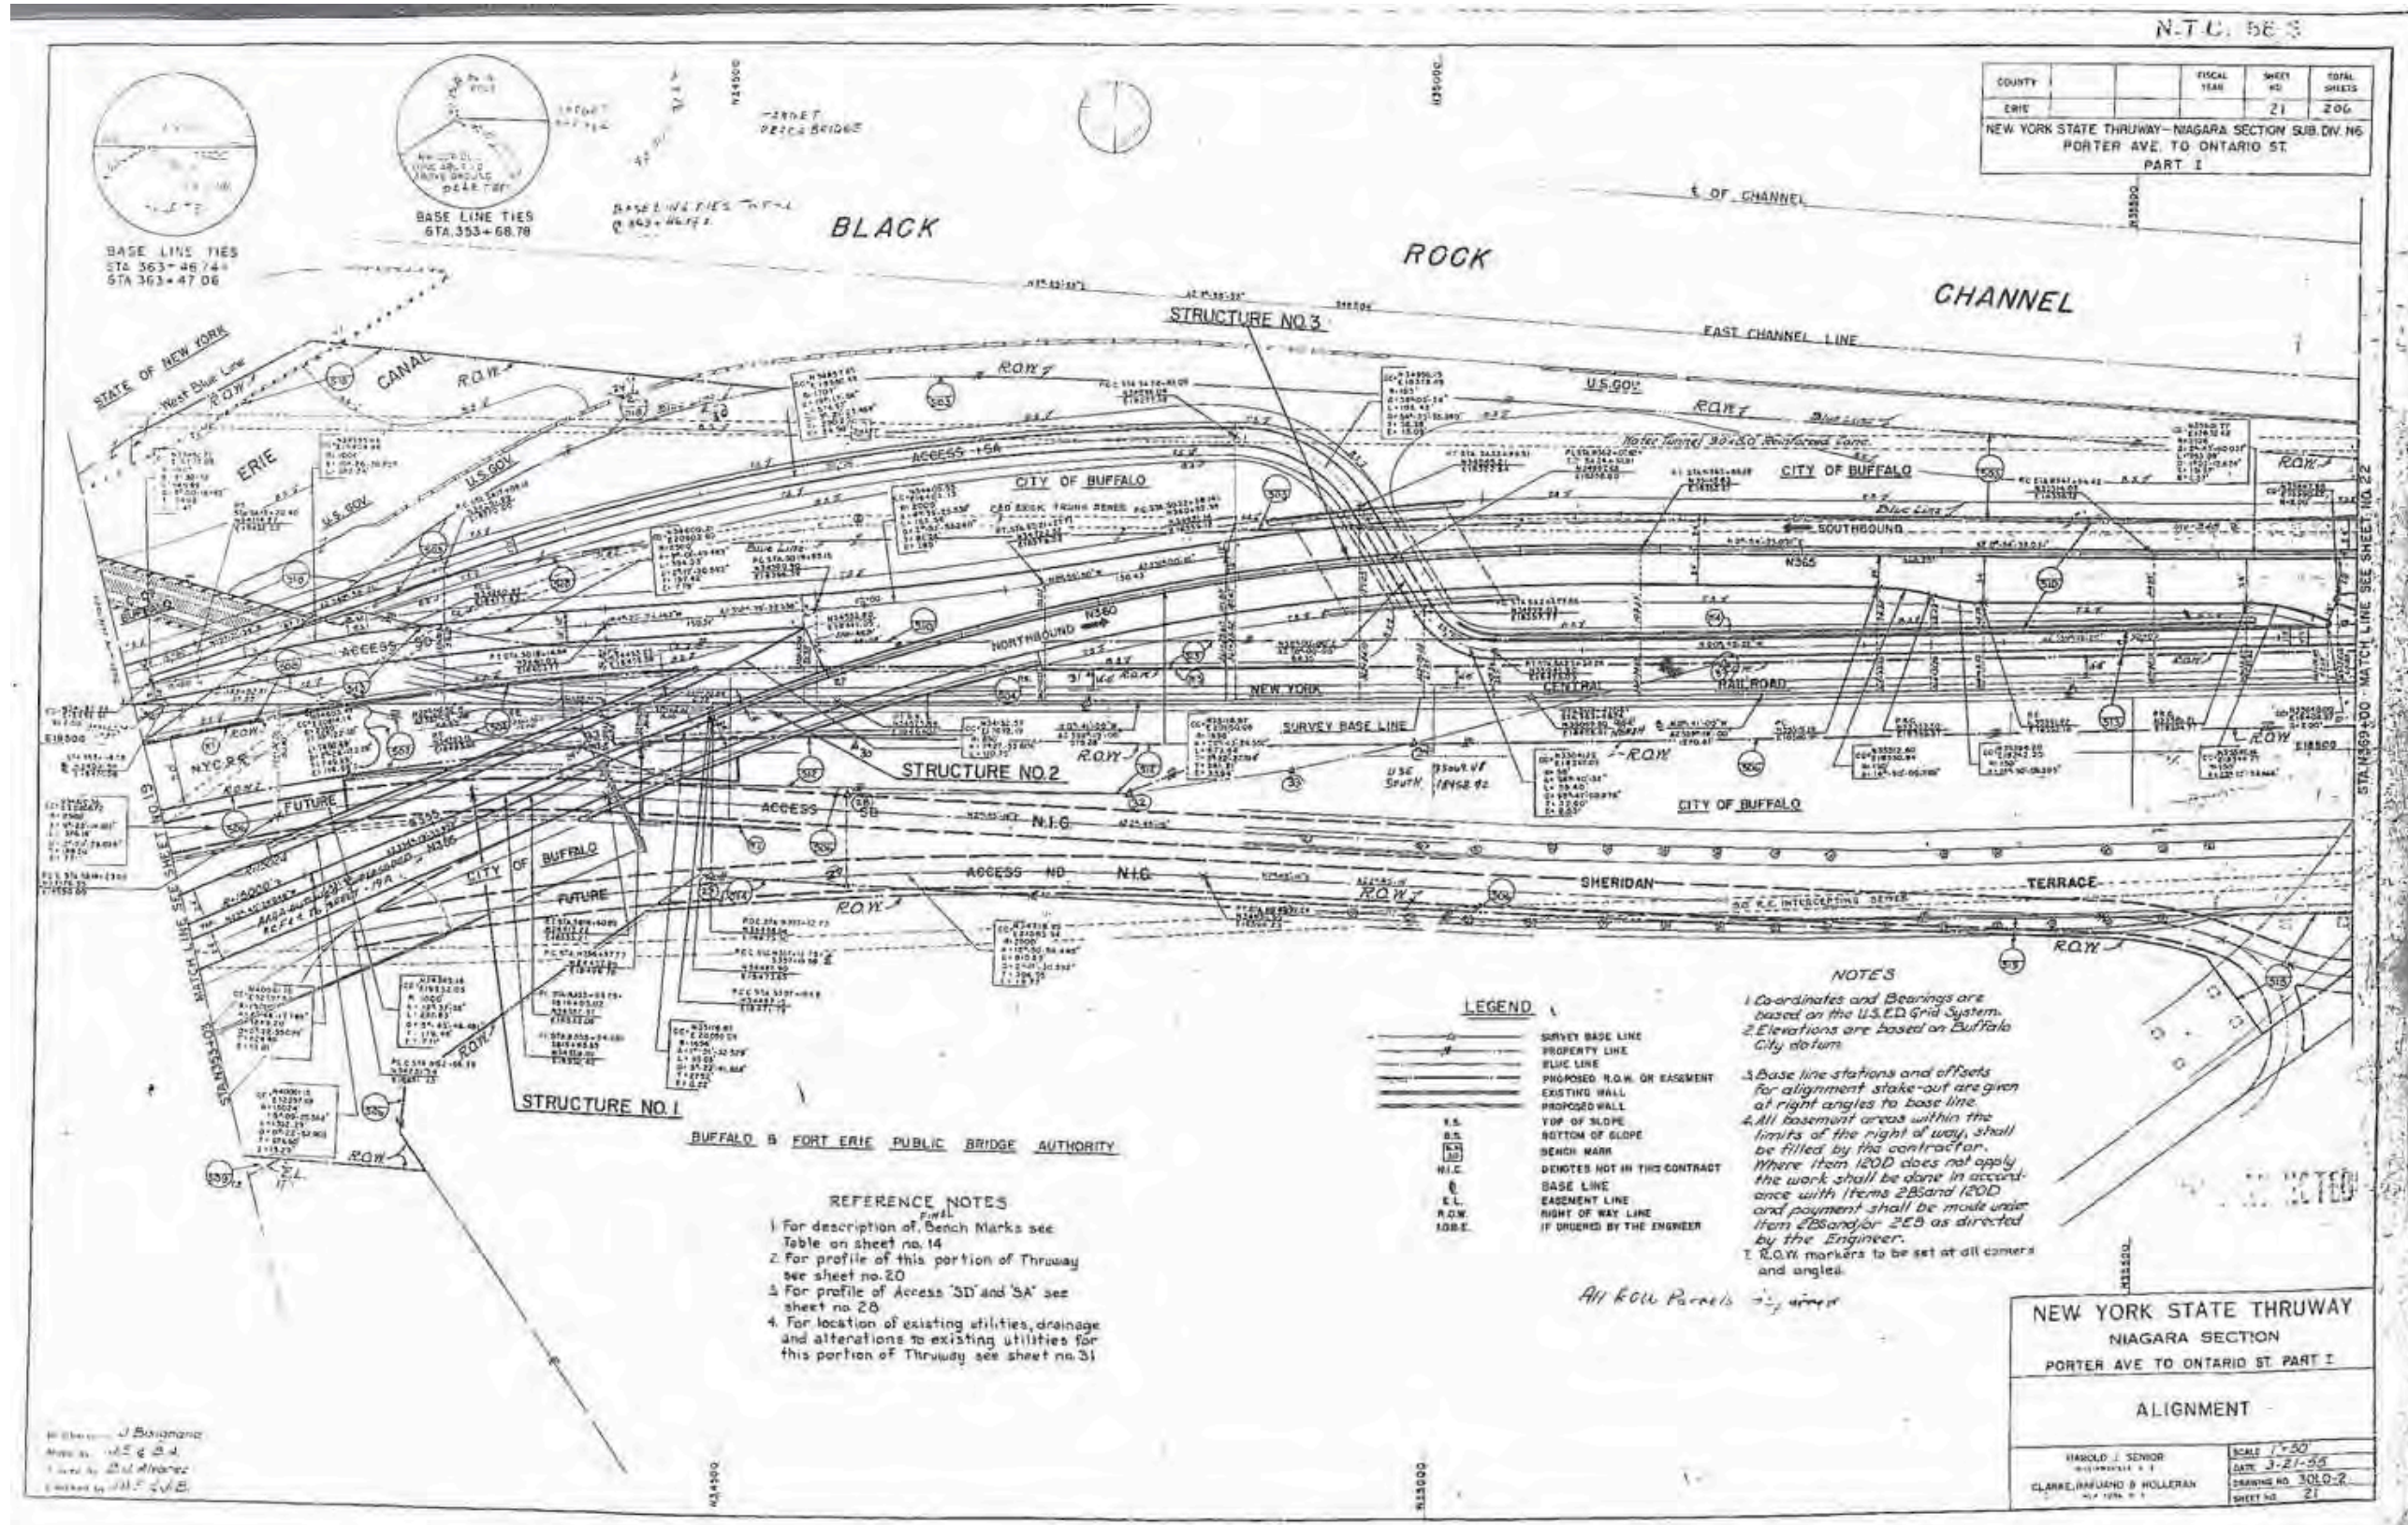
Alignment Sheet No. 21, New York State Thruway, Niagara Section, dated 3-21-55.
